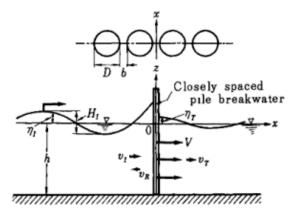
Pile breakwater (D'Angremond et.al., 2008)
